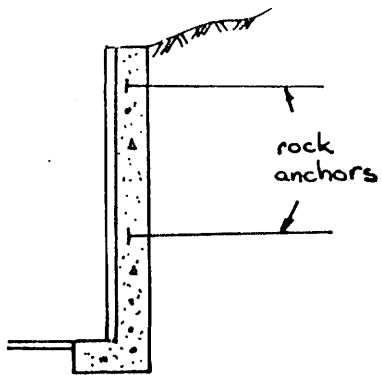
REVETMENT OF ROCK WITH ANCHORED SOIL RETAINING WALLS.
